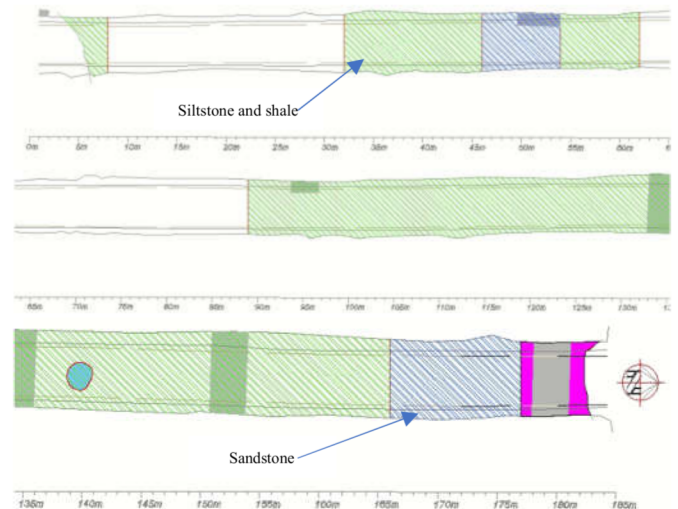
Plan of Tunnel with Geology and Stabilisation Configuration Highlighted
